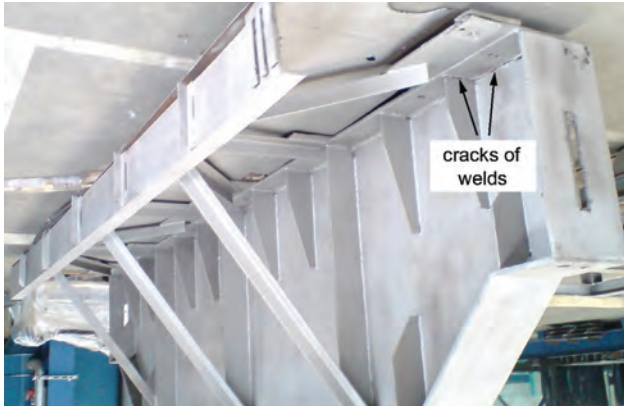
Damage of one of the crane beams: weld cracks at the interface between the web and ribs and the upper flange
